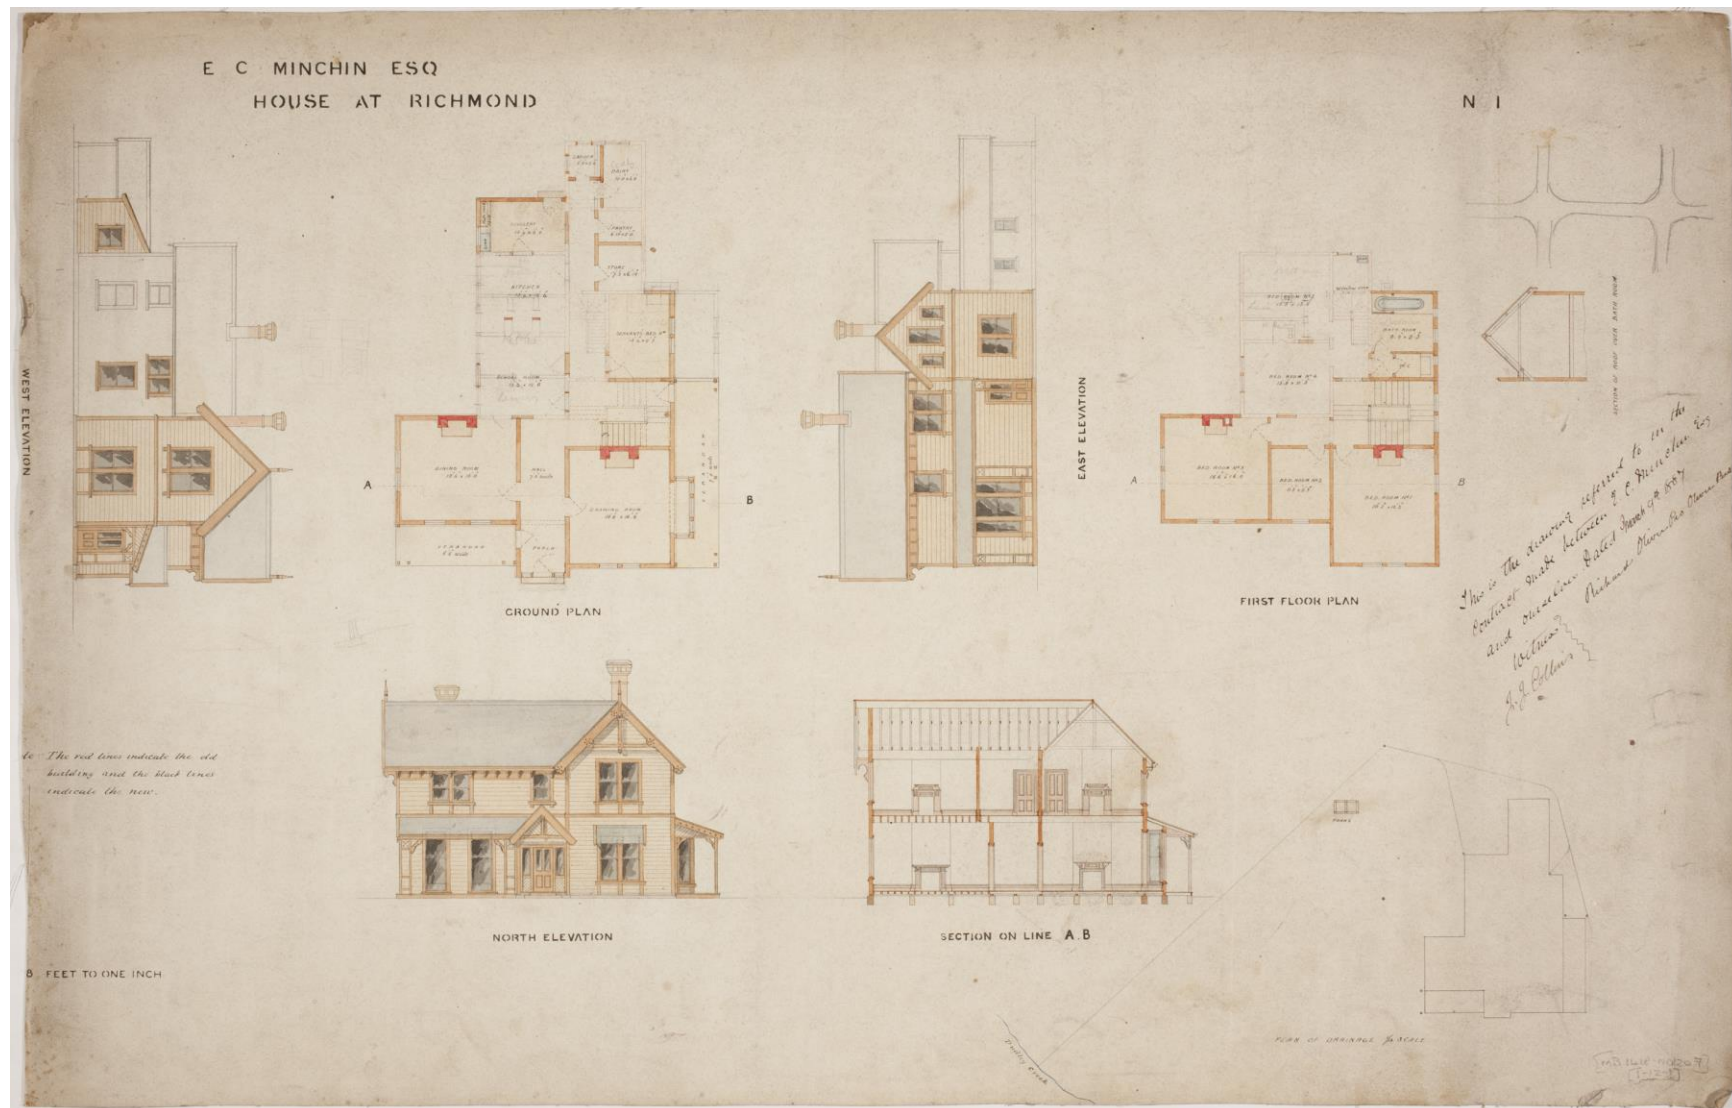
Collins and Harman, E. C. Minchin, Esq., House at Richmond, plans, elevations and sections (1887).
